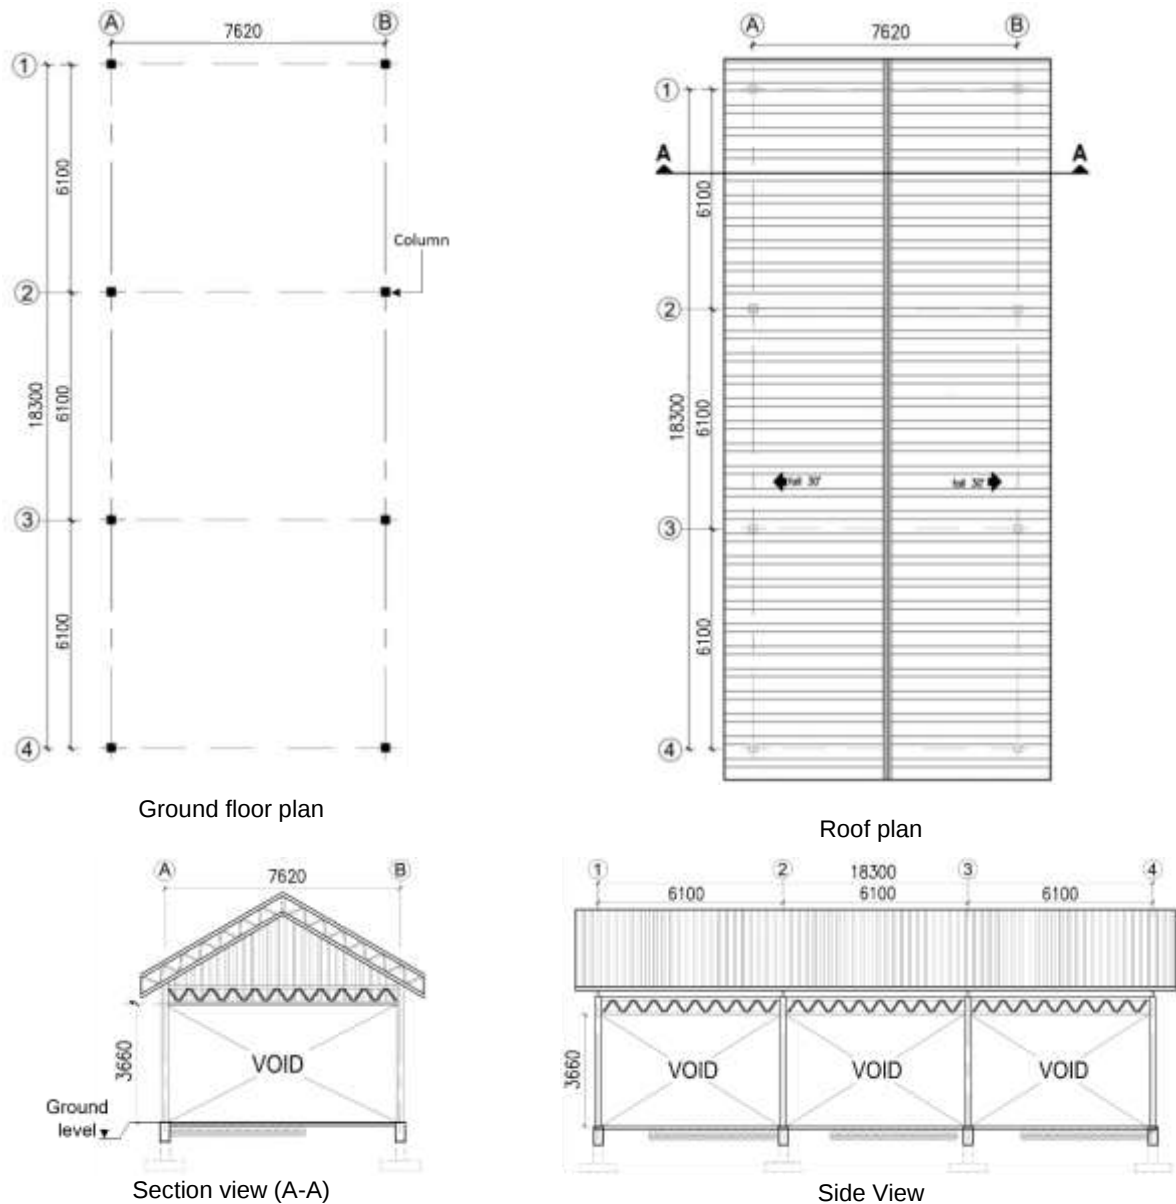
Typical Plan Layout and View for Open Hall (Building without Wall)
